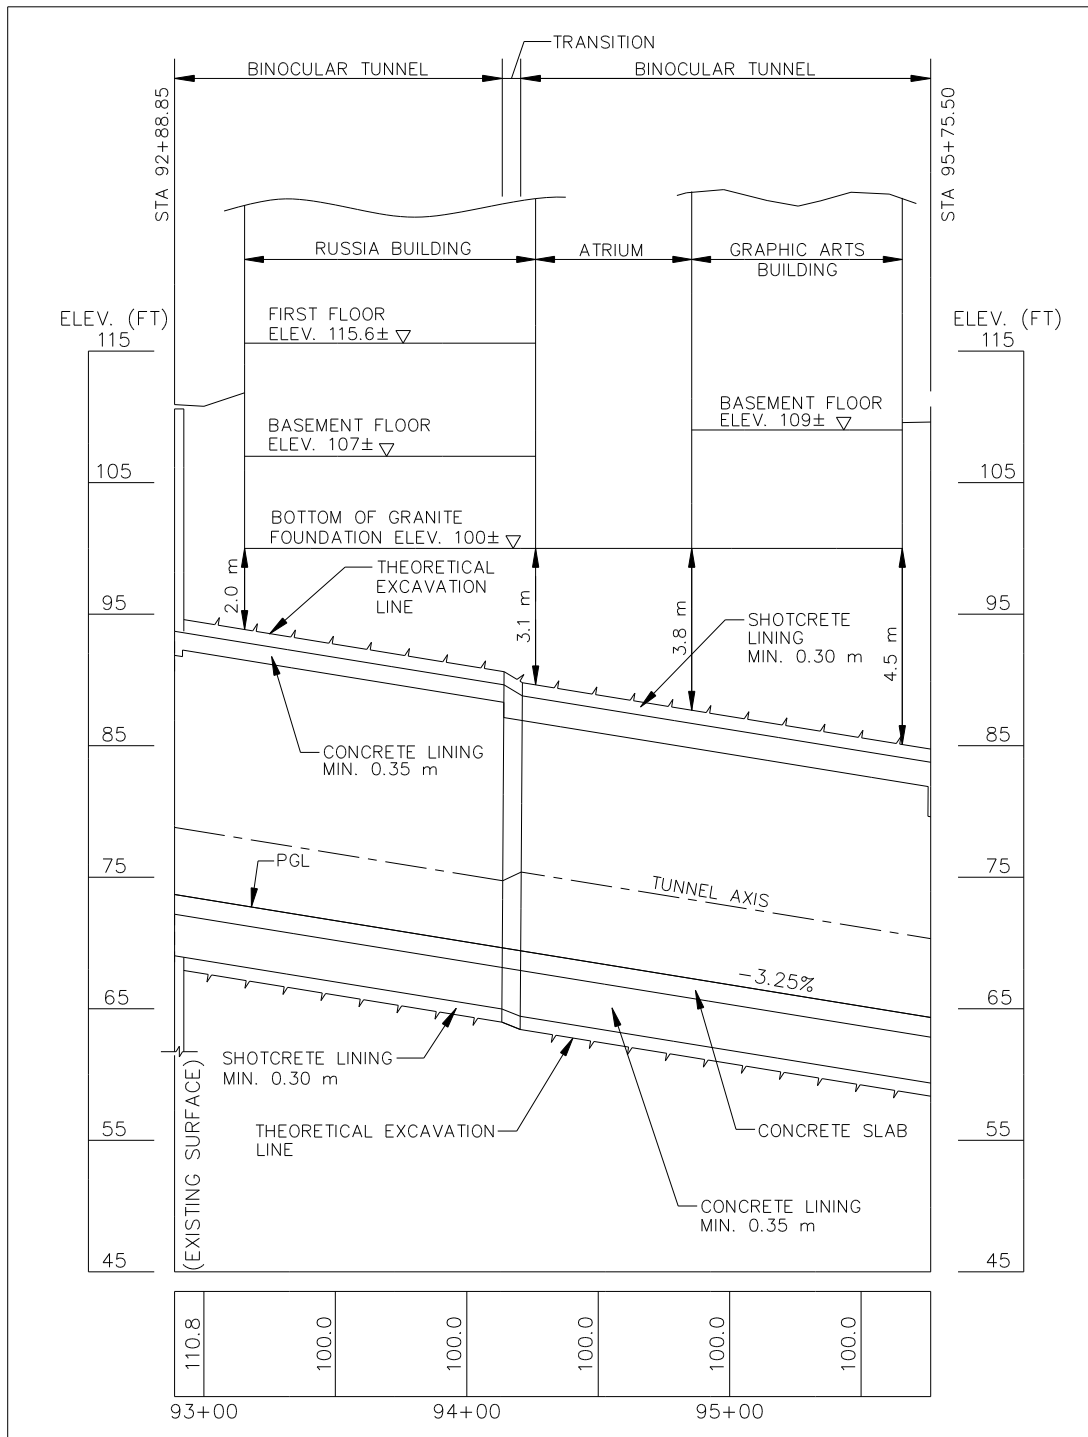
Tunnel Longitudinal Section at Russia and Graphic Arts Buildings (Outbound Tunnel)
